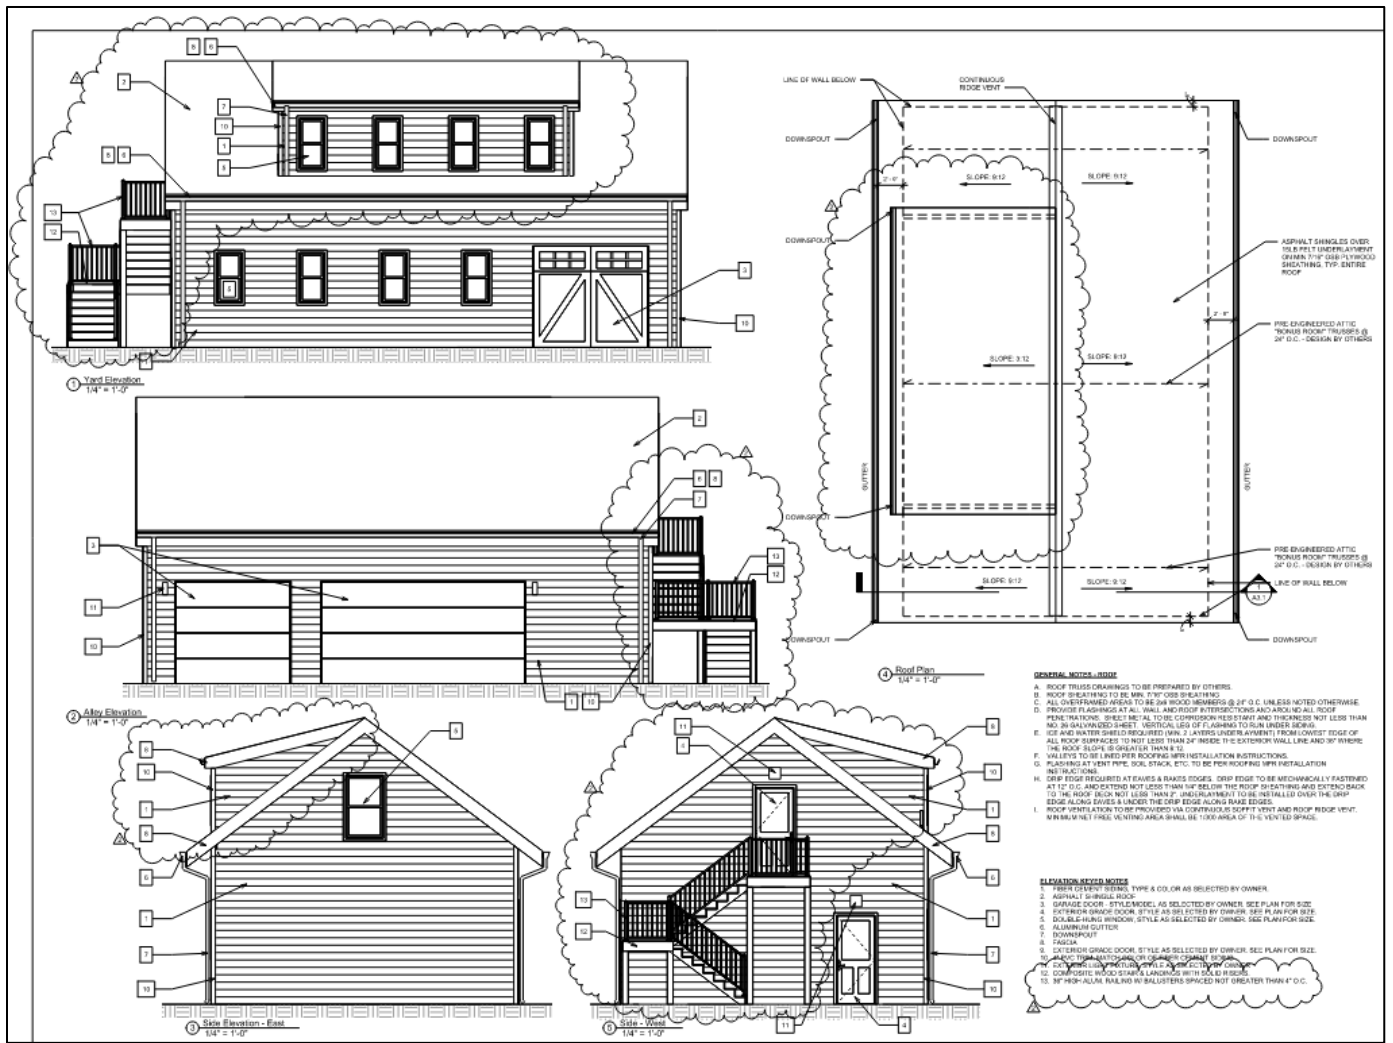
Proposed new design featuring exterior staircase and large shed dormer.
